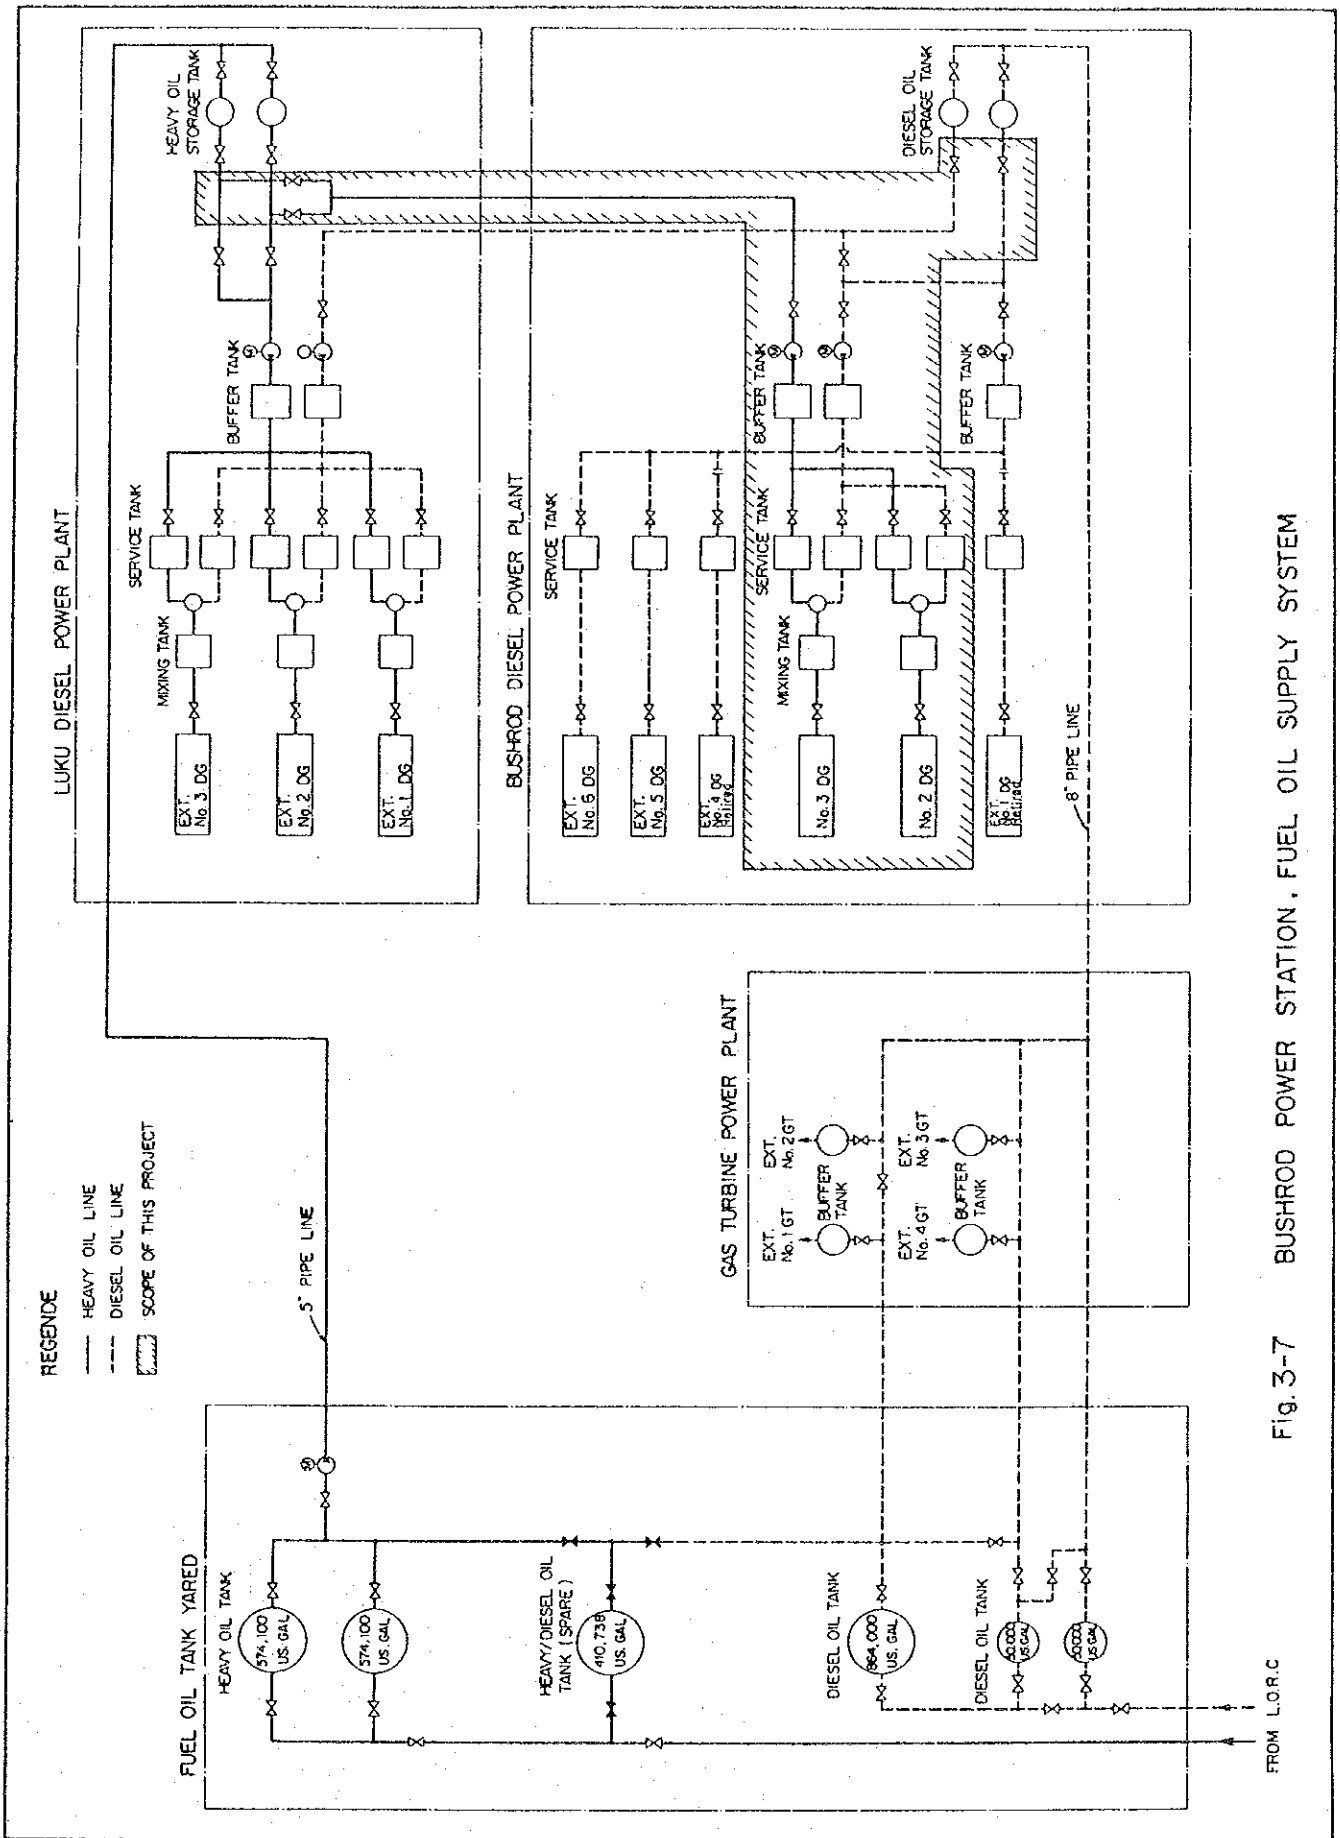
BUSHROD POWER STATION, FUEL OIL SUPPLY SYSTEM
